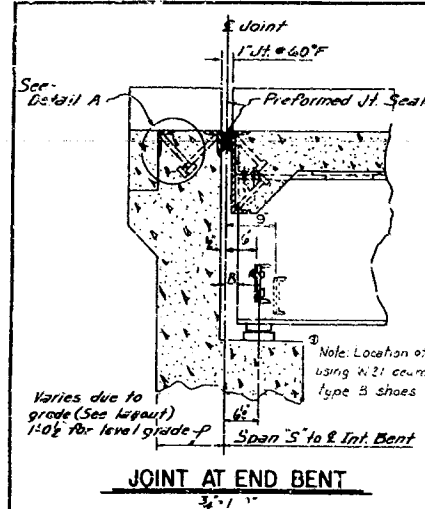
DETAILS OF COMPOSITE BEAM SPANS .02 FT/FT SLOPE - 370" CLR. FROM MARKED TREE - FAYETTEVILLE, MISSOURI POLK COUNTY
